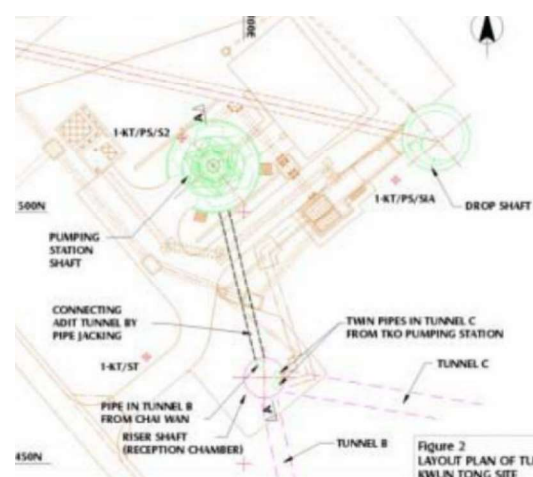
layout plan of tunnels at Kwun Tong site (Leslie et al. 2002)
